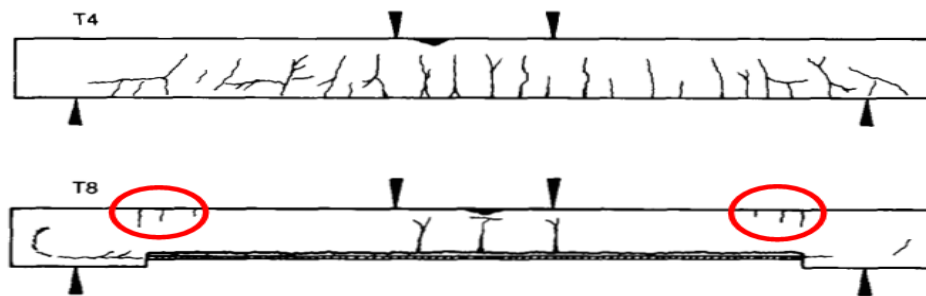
Contrast in crack formation between beam T4 with bonded reinforcement, and beam T8 with bars exposed(Cairns & Zhao, 1994)
